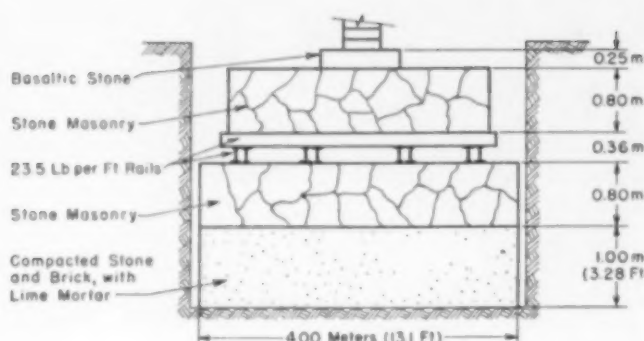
TYPICAL footing of department store, Palacio de Hierro, shows excavation about 13 ft wide and 10.7 ft deep, containing masonry slab supporting steel rail grillage, which in turn supports footing. Building has behaved well but present cost of this type of foundation is prohibitive.
